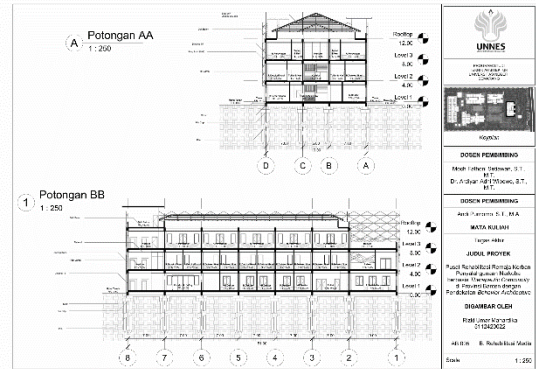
Medical Rehabilitation Building Section A-A and Section B-B
